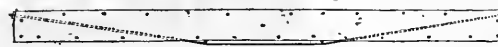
TRUSS BEAM, 30 FEET LONG.
